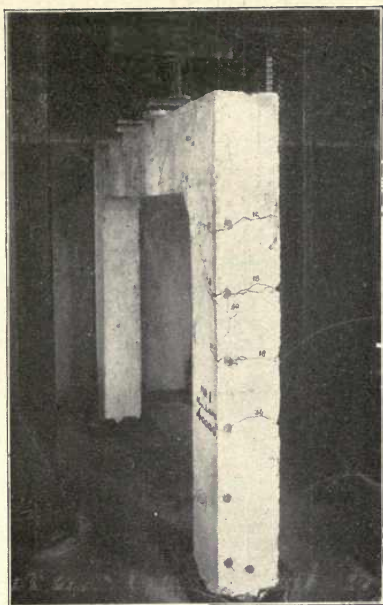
VIEW OF FRAME 1 IN TESTING MACHINE
